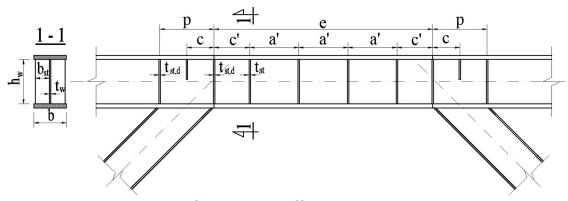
Arrangement of transverse stiffeners to intermediate dissipative bars
